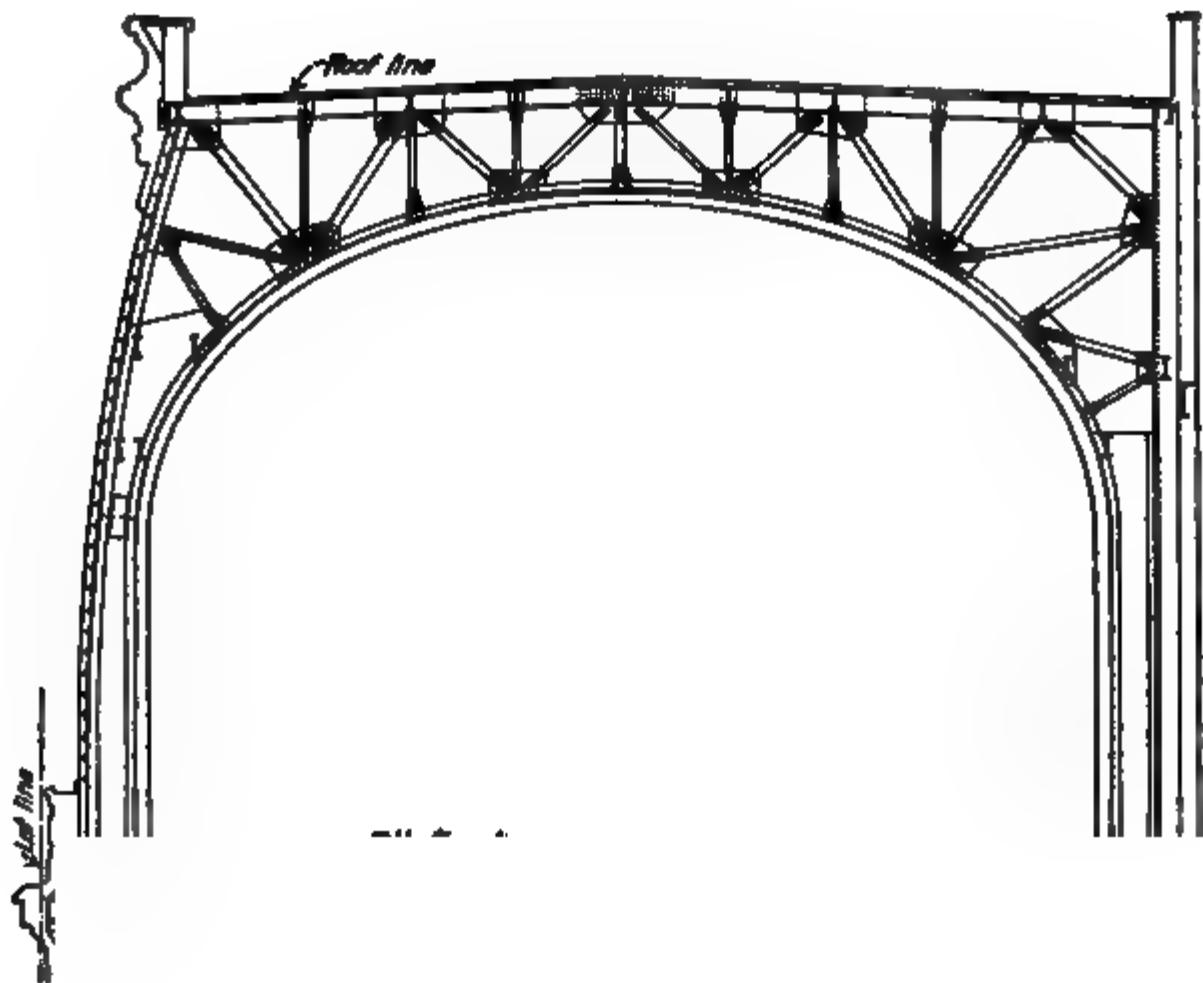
Trusses for roof over Grand Banquet Hall, La Salle Hotel.
